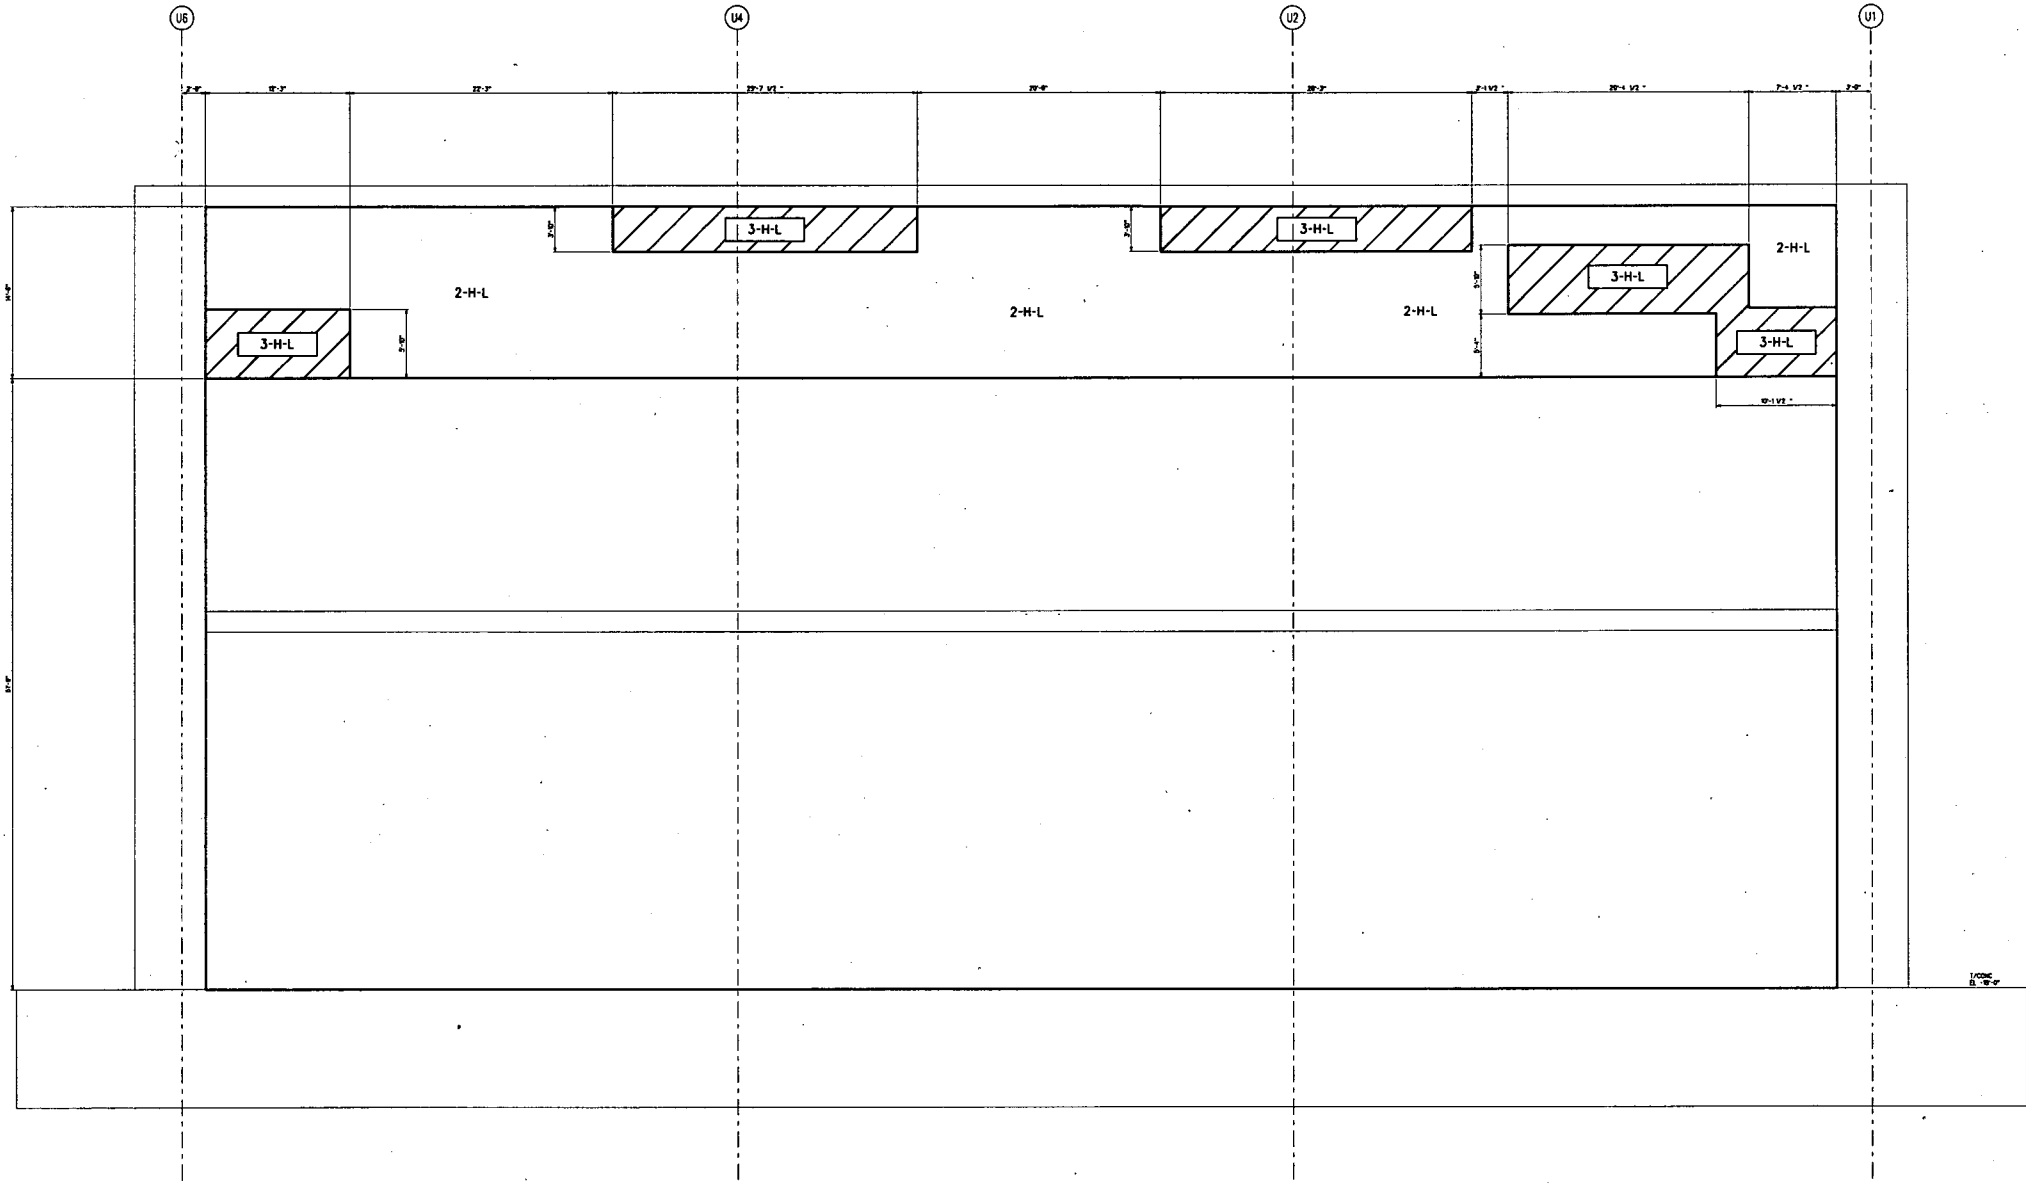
H.6-54: PUMPHOUSE NORTH WALL LOOKING SOUTH
